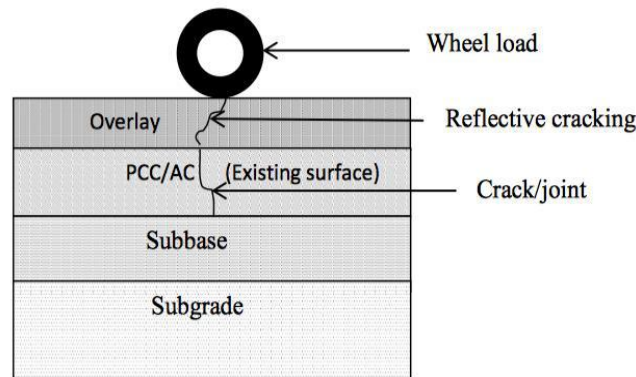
A schematic of reflective cracking in composite pavement (Shalaby and Frechette, 2000)
